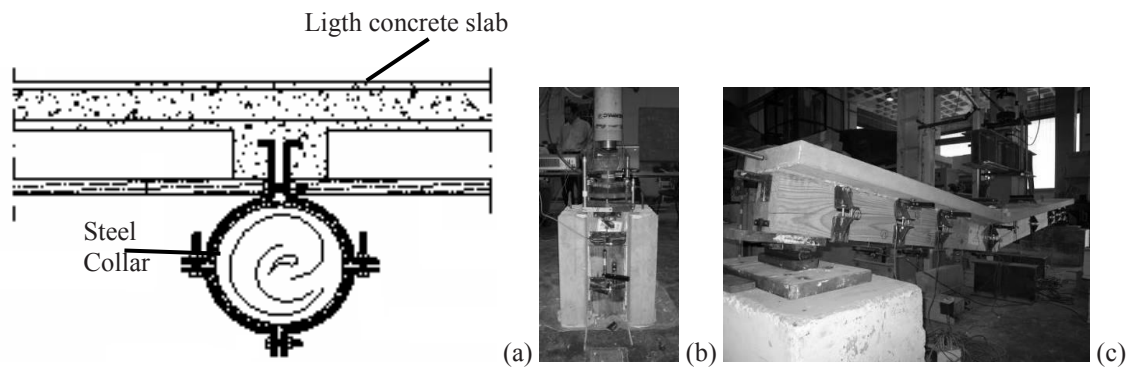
Timber-steel-concrete connections: (a) cross-section with steel collars around circular wooden beams; (b) push-out test on concrete slab-wooden beam connection specimen; (c) test on composite beam with rectangular cross-section.
